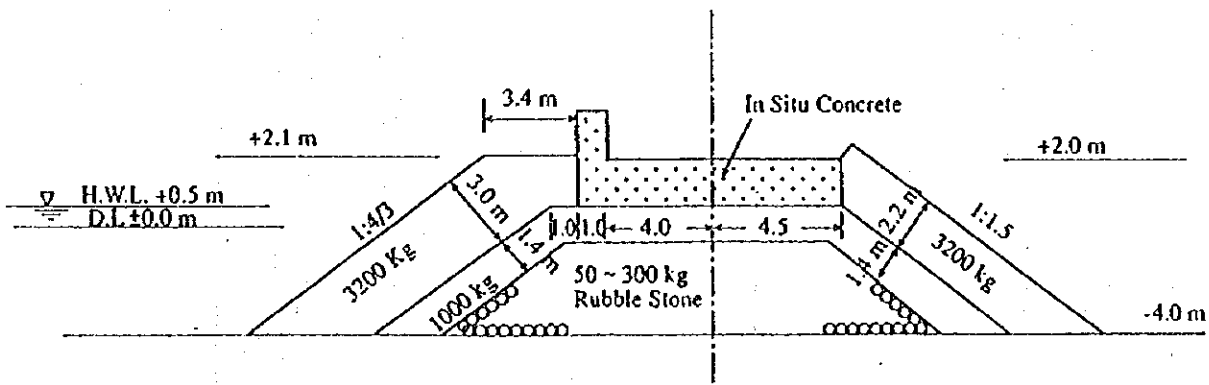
Standard Cross Section of Breakwater (-4.0m)
